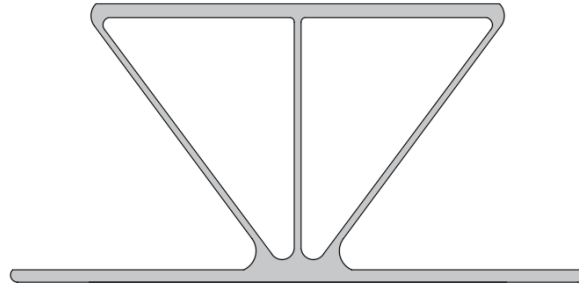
Cross-section of a typical orthotropic deck panel (adopted from Dobmeier *et al.* (2001)).
